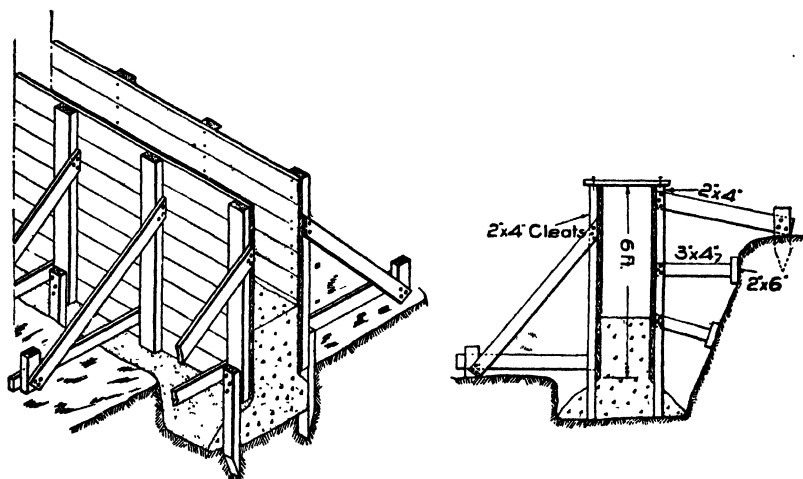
Forms for Foundation Walls. (See p. 19.)
